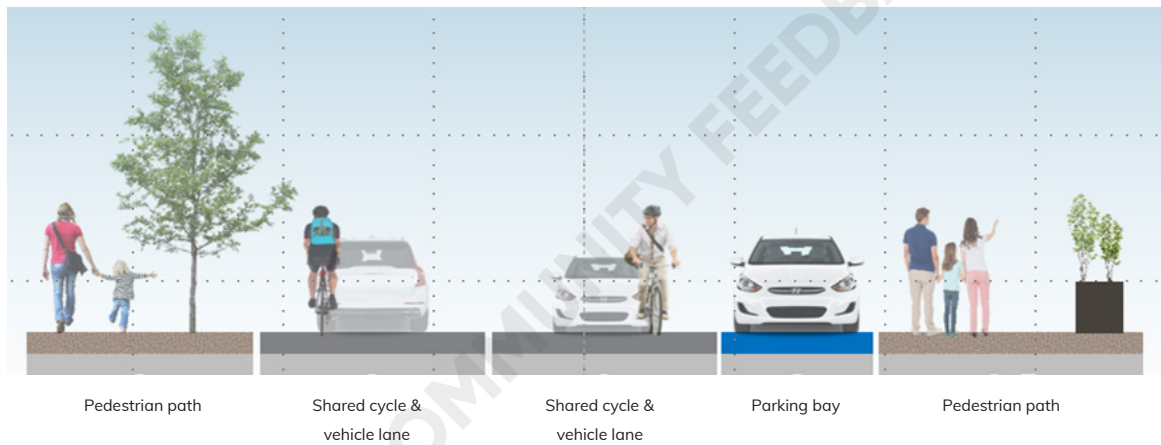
Cremorne Street – proposed medium term layout (indicative only)
